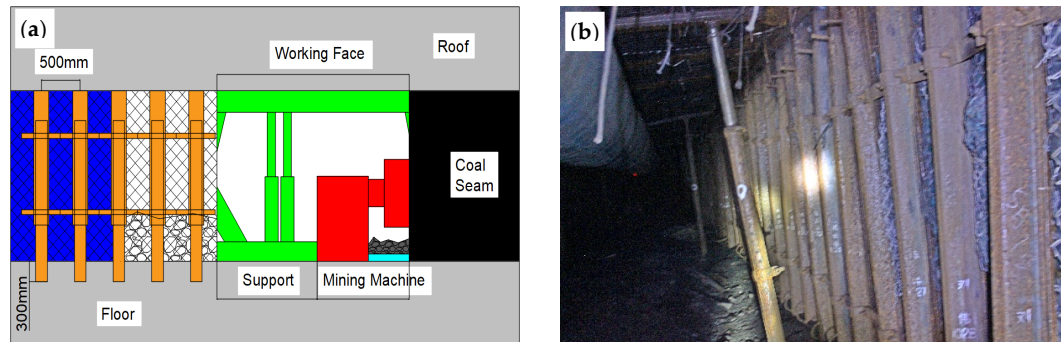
Design and construction of temporary support: (a) design; (b) construction.
